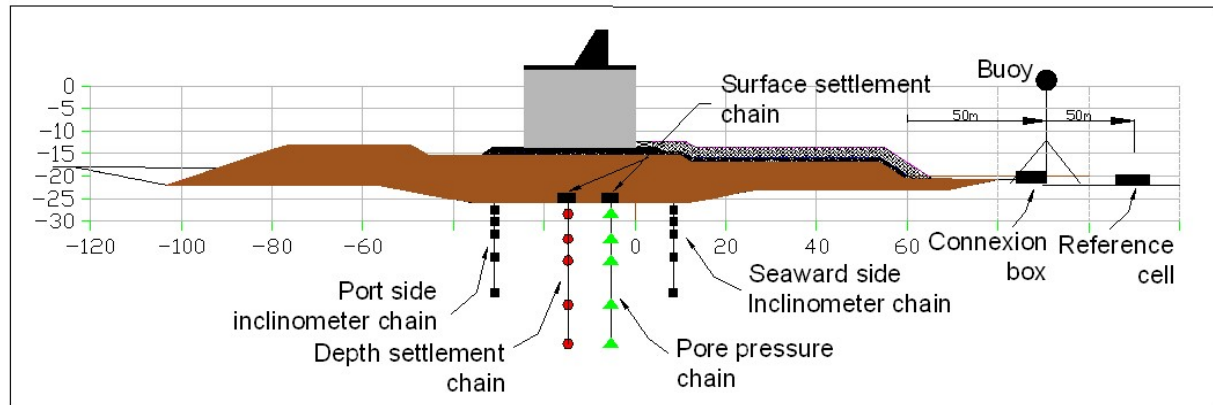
Typical cross section for vertical breakwater instrumentation.
